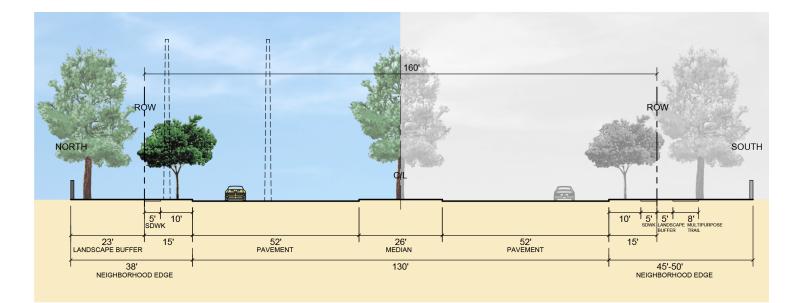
EUCLID AVENUE STREET SECTION
